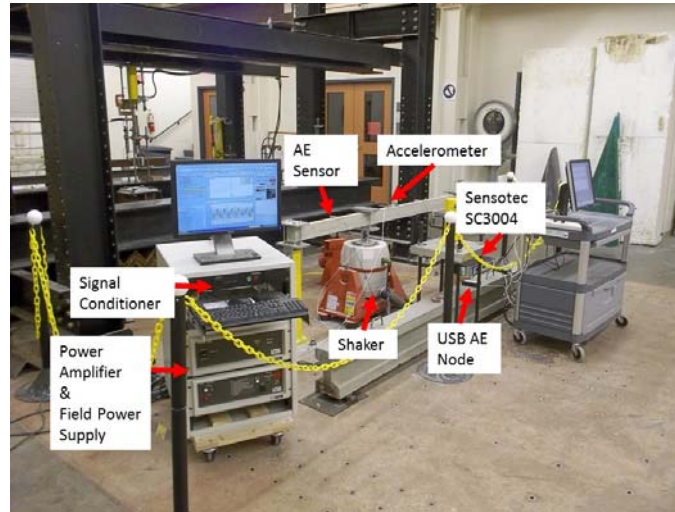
General view of test setup for reinforced concrete beam.
